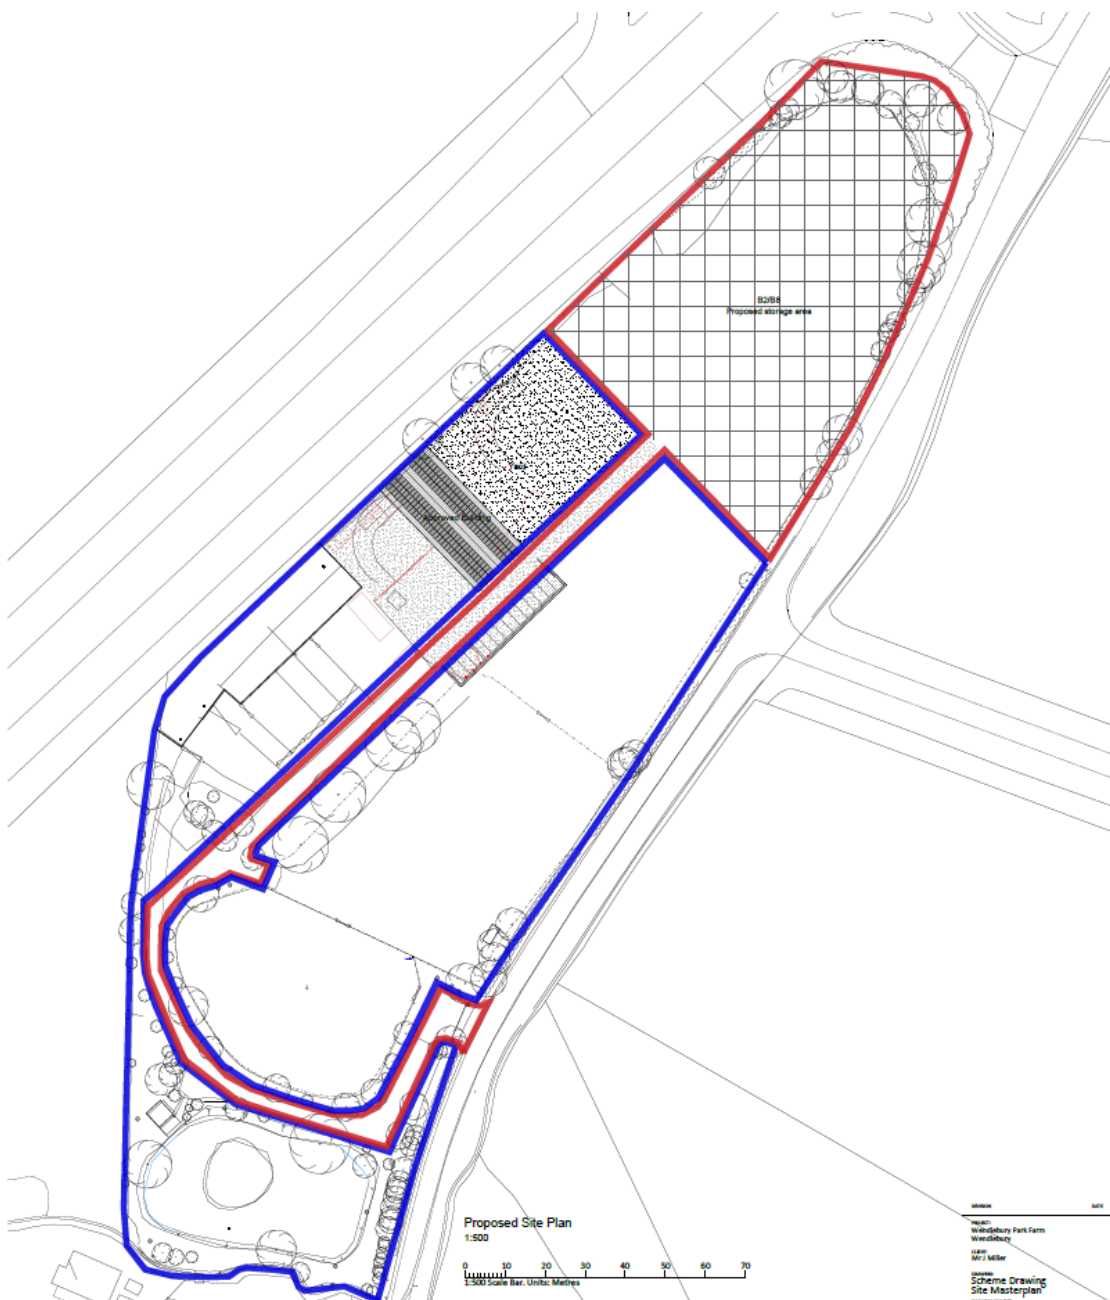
Proposed Site Plan: Site Masterplan (post-development).
